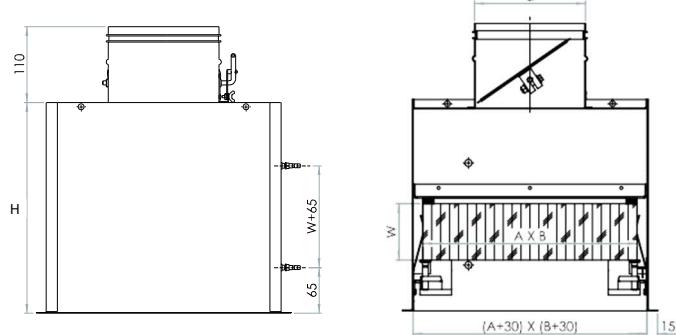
Dimensions of the box with the top connection pipe and Pg damper adjusted in the connection pipe.
